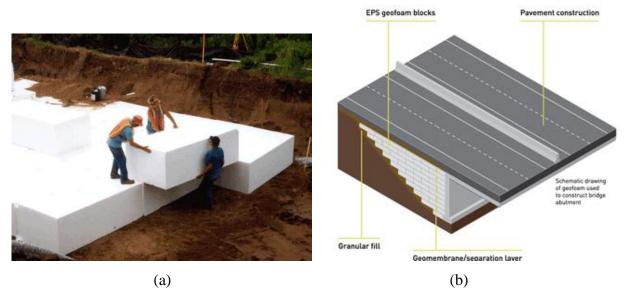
Expanded Polystyrene (EPS) Geofoam (a) Installation (Royal Foam, 2010) (b) Schematic showing use in road and bridge construction (AFM, 2015)
